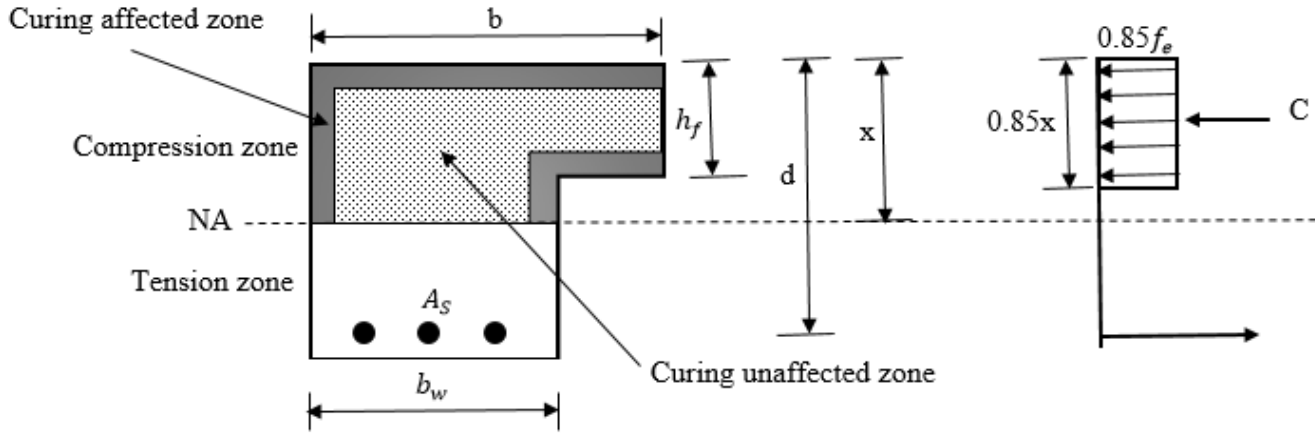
Cross-sectional view of L-section singly reinforced beam (NA within web)
